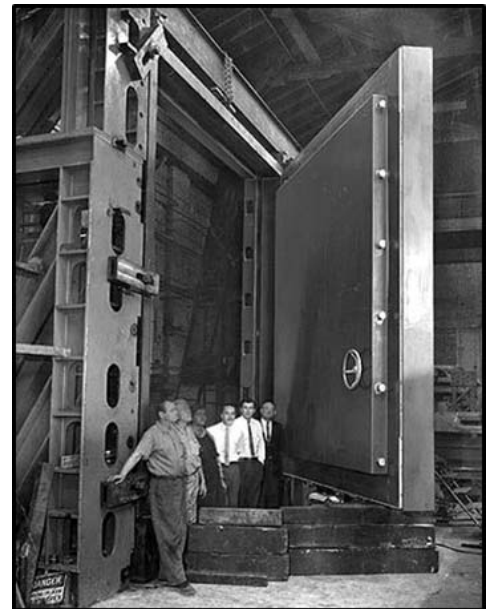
Blast Doors – Four 25 ton blast door protected the underground facility against a nuclear attack. Source: Department of Defense – [file:\GreenbrierDoor[49].jpg].
